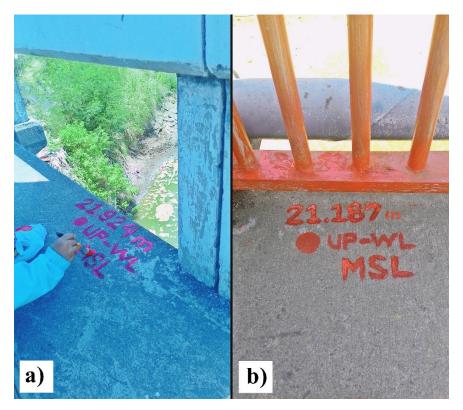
Water-level markings on the bridge of a) Quiaoit Bridge 1 and b) Quiaoit Bridge 2
